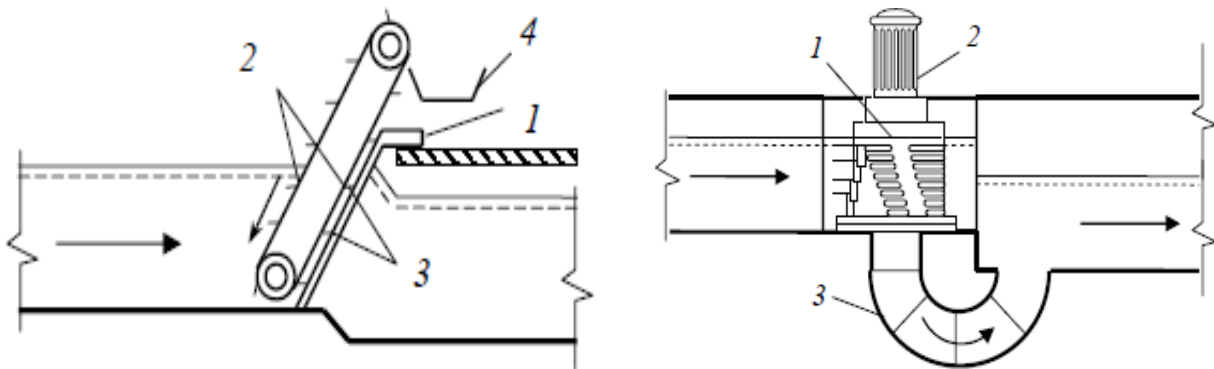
Grid crushers of RD type: a – grid with mechanical rakes: 1 – grid; 2 – endless chain; 3 – rakes; 4 – conveyor; b – grid crusher RD: 1 – slot drum; 2 – drive mechanism; 3 – outlet ducker
